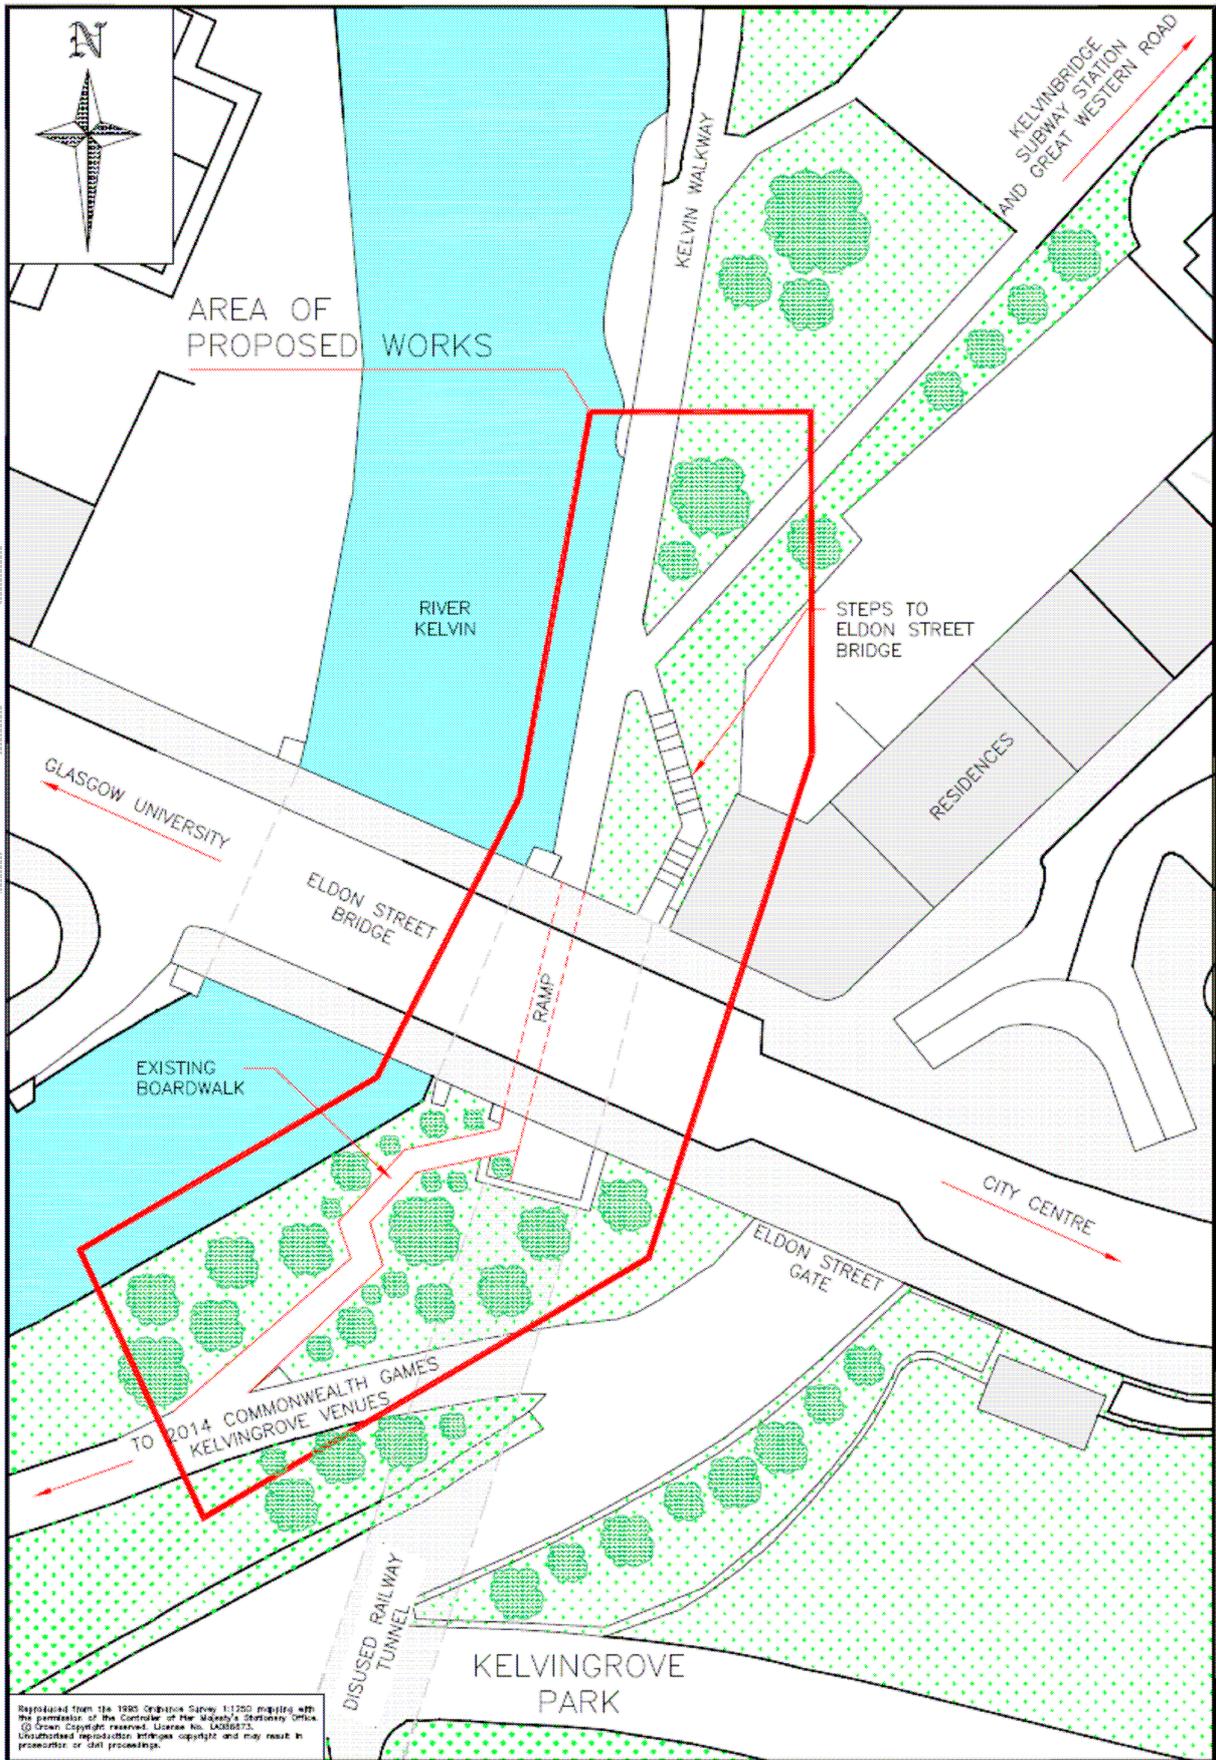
Location Plan – Kelvin Walkway / Eldon Street Underpass
